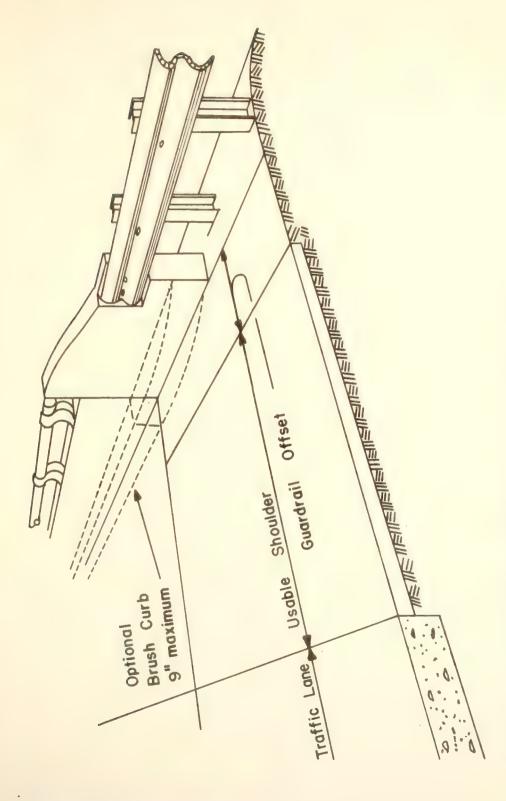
GUARDRAIL - BRIDGERAIL TRANSITION 46
